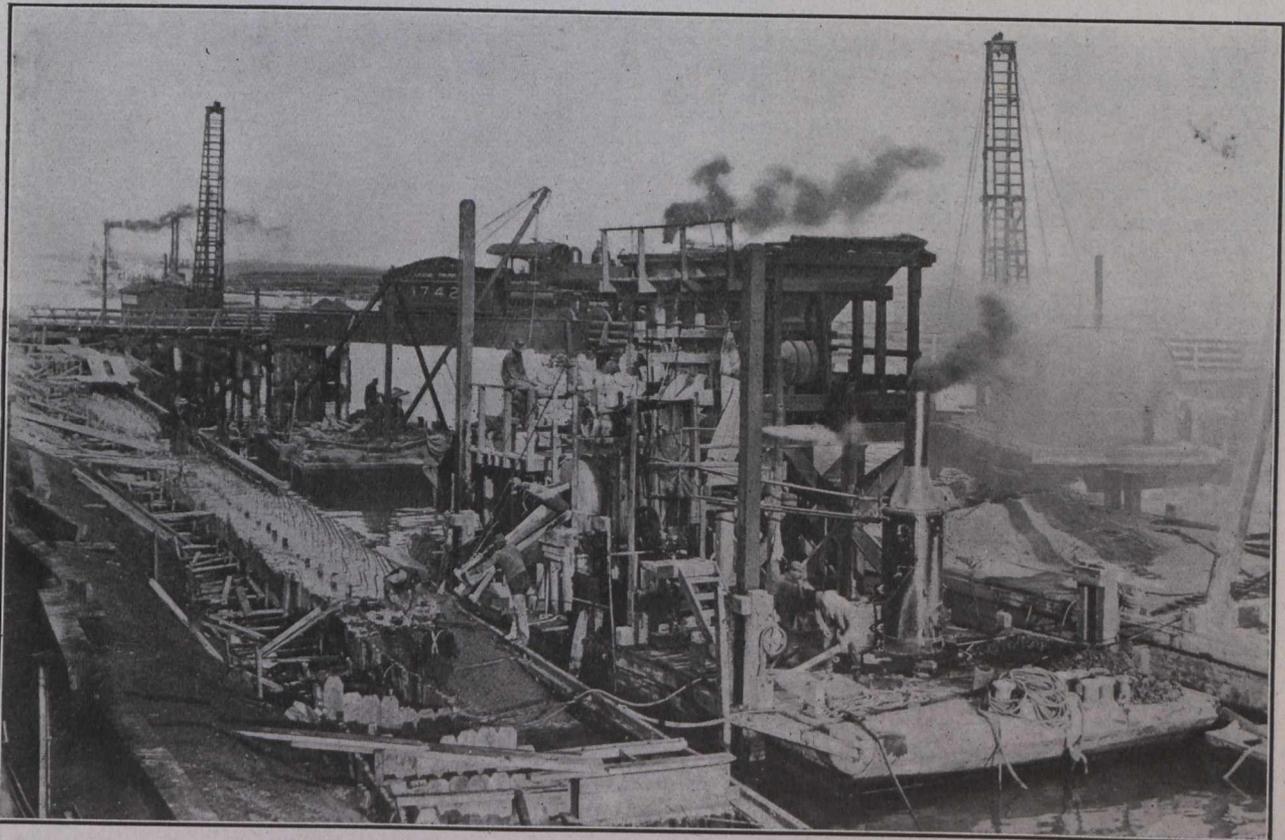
Concrete Handling Plant at Work on Don Diversion Channel Walls, Toronto Harbor Commission.
